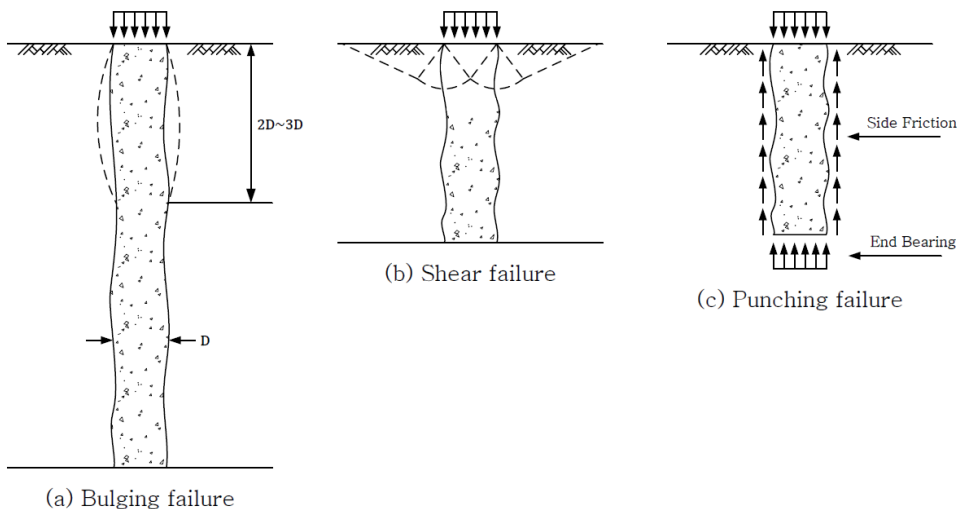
Failure modes of stone column (Barkdale and Bachus, 1983)
